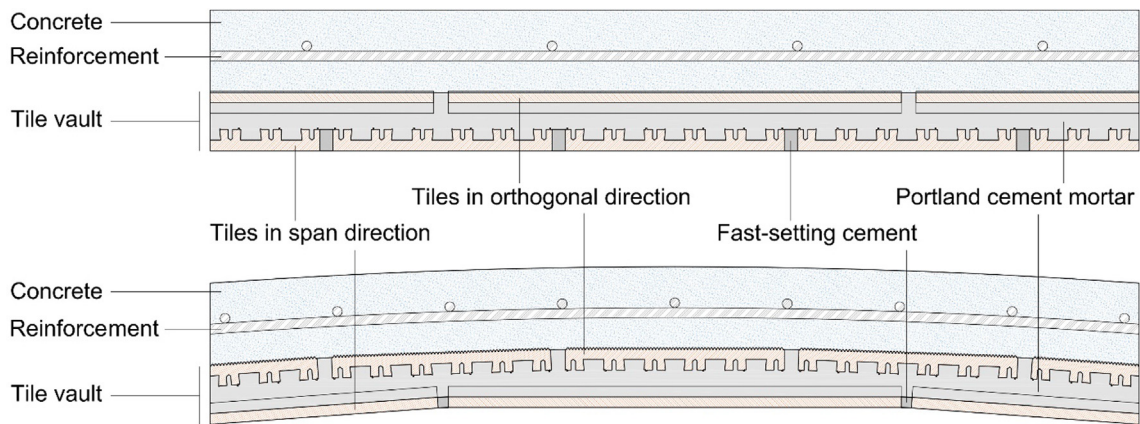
Possible transversal and longitudinal cross-sections of the composite system. Featuring a two-layered tile vault and reinforced concrete [1].
